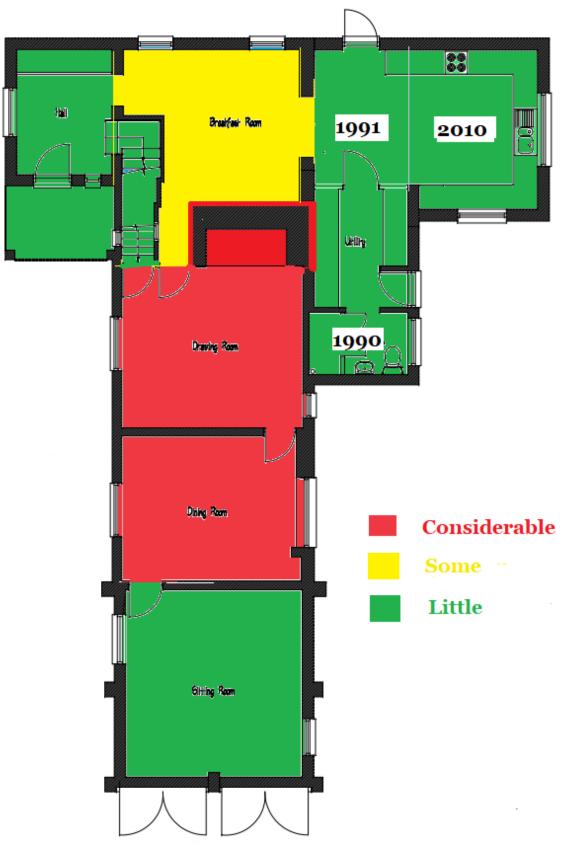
Significance plan (AHP, from ground floor plan by Aria Design)
